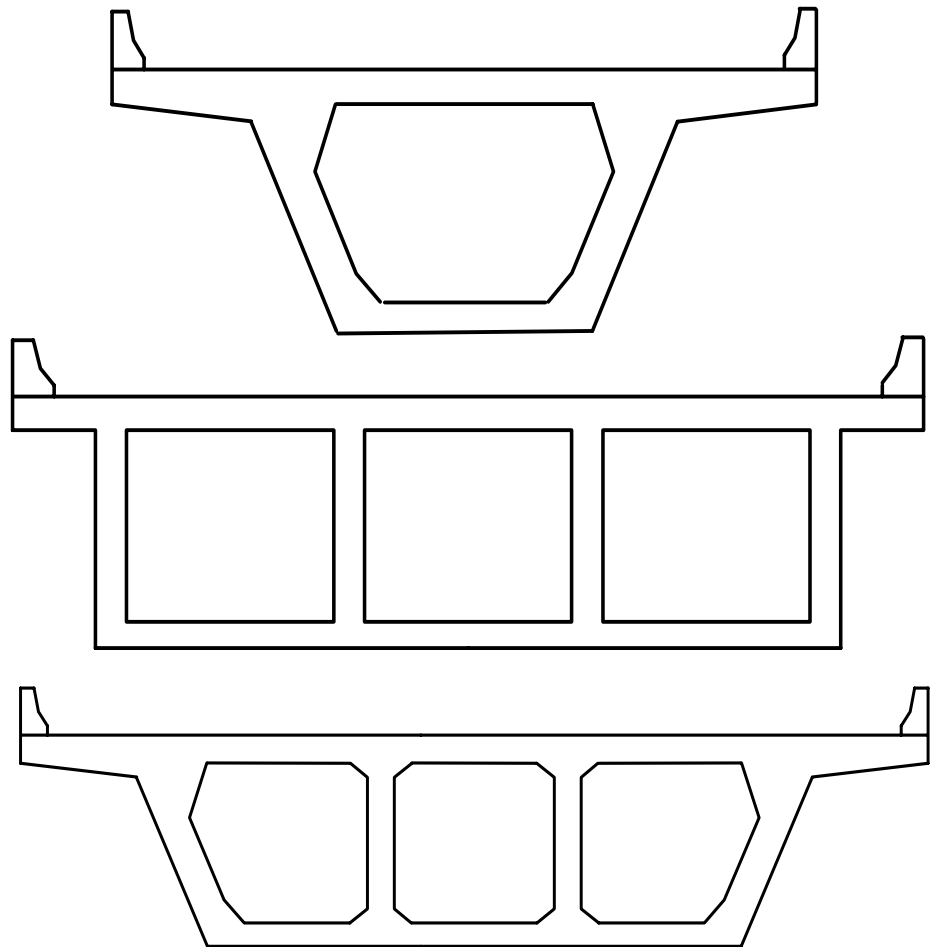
Typical Concrete Box Girder Cross Sections
